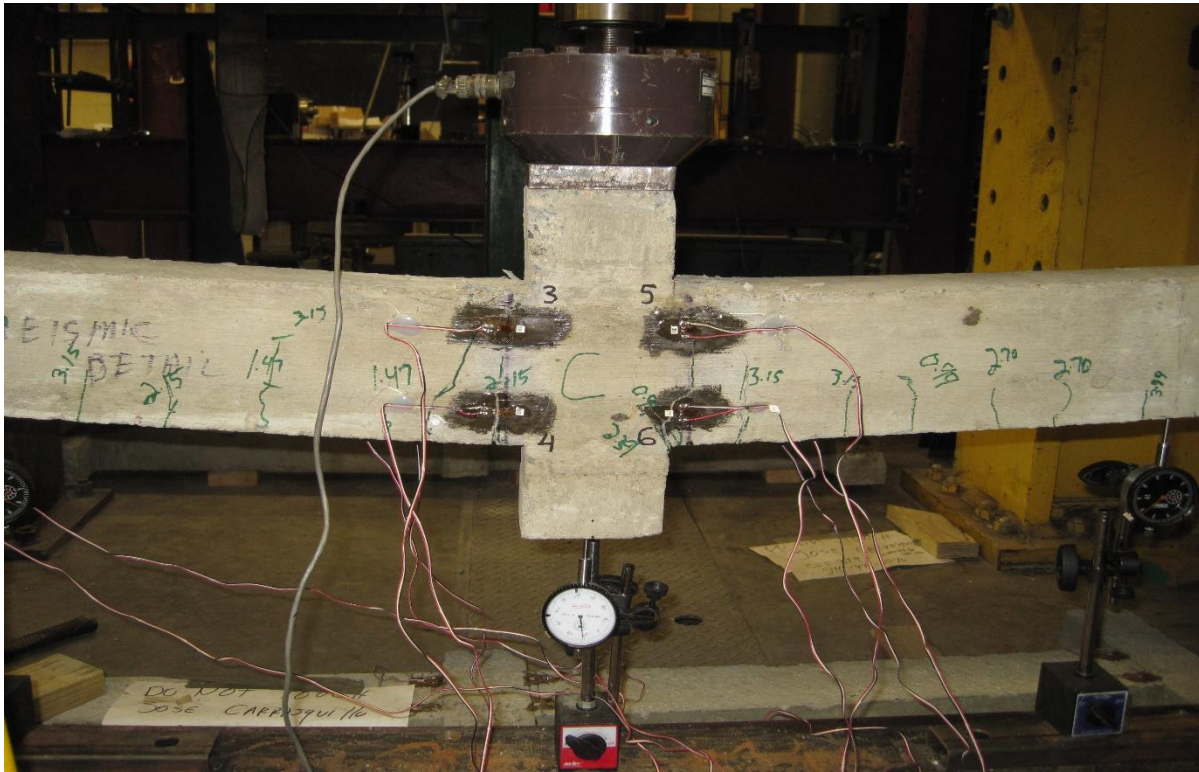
Missing Column Crack Pattern at the Collapsed Load for Sub-assembly S2-2
